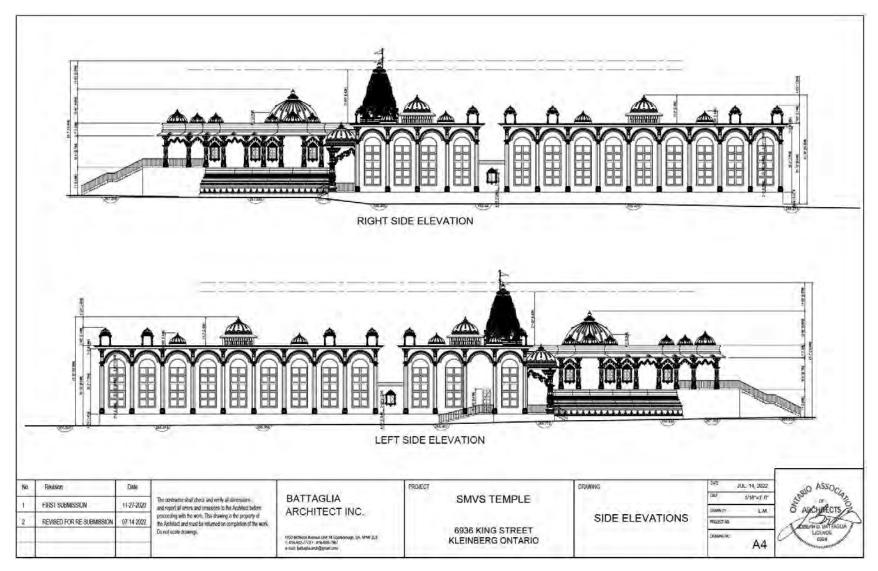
Proposed right and left elevations (Battaglia Architects Inc.)
